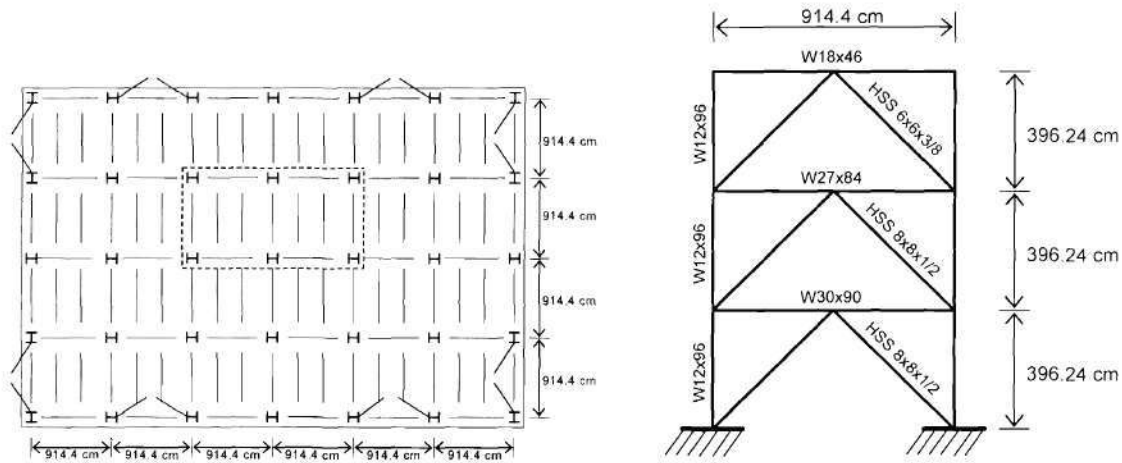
Plan (left) and elevation (right) of the 3-story steel frame
